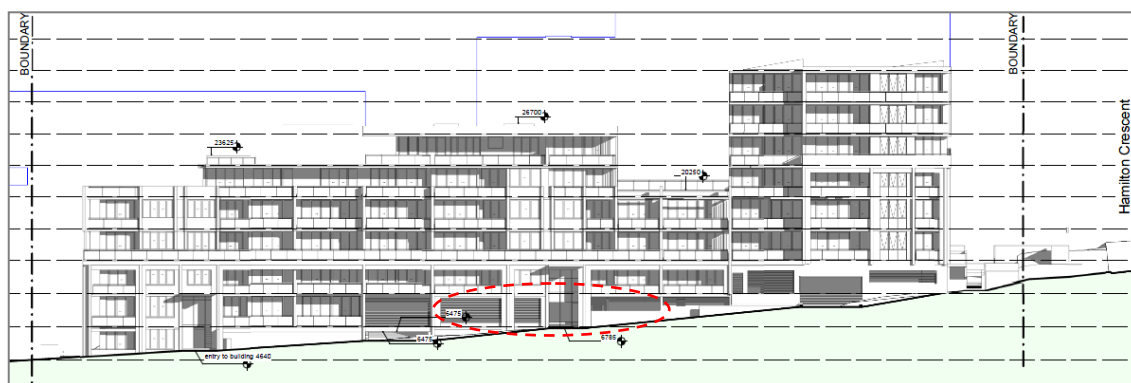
Extract of the Eastern Elevation Plan approved by DoPI to discharge Condition B2 of the Stage 1 Project Approval (MP09_0216). This Belmore Street elevation identifies (in red) the areas which provide blank wall facades at street level, despite the stepped design of the development in response to the site's sloping topography.
